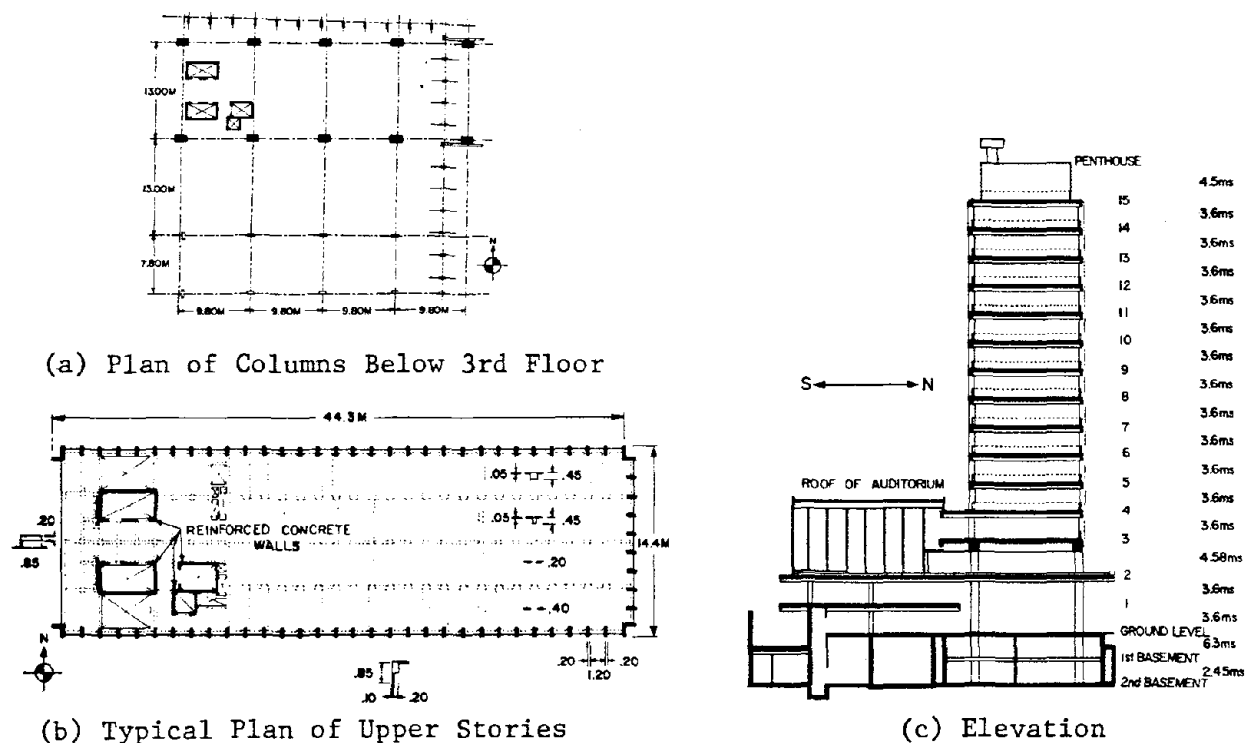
PLANS AND ELEVATION OF BANCO CENTRAL
